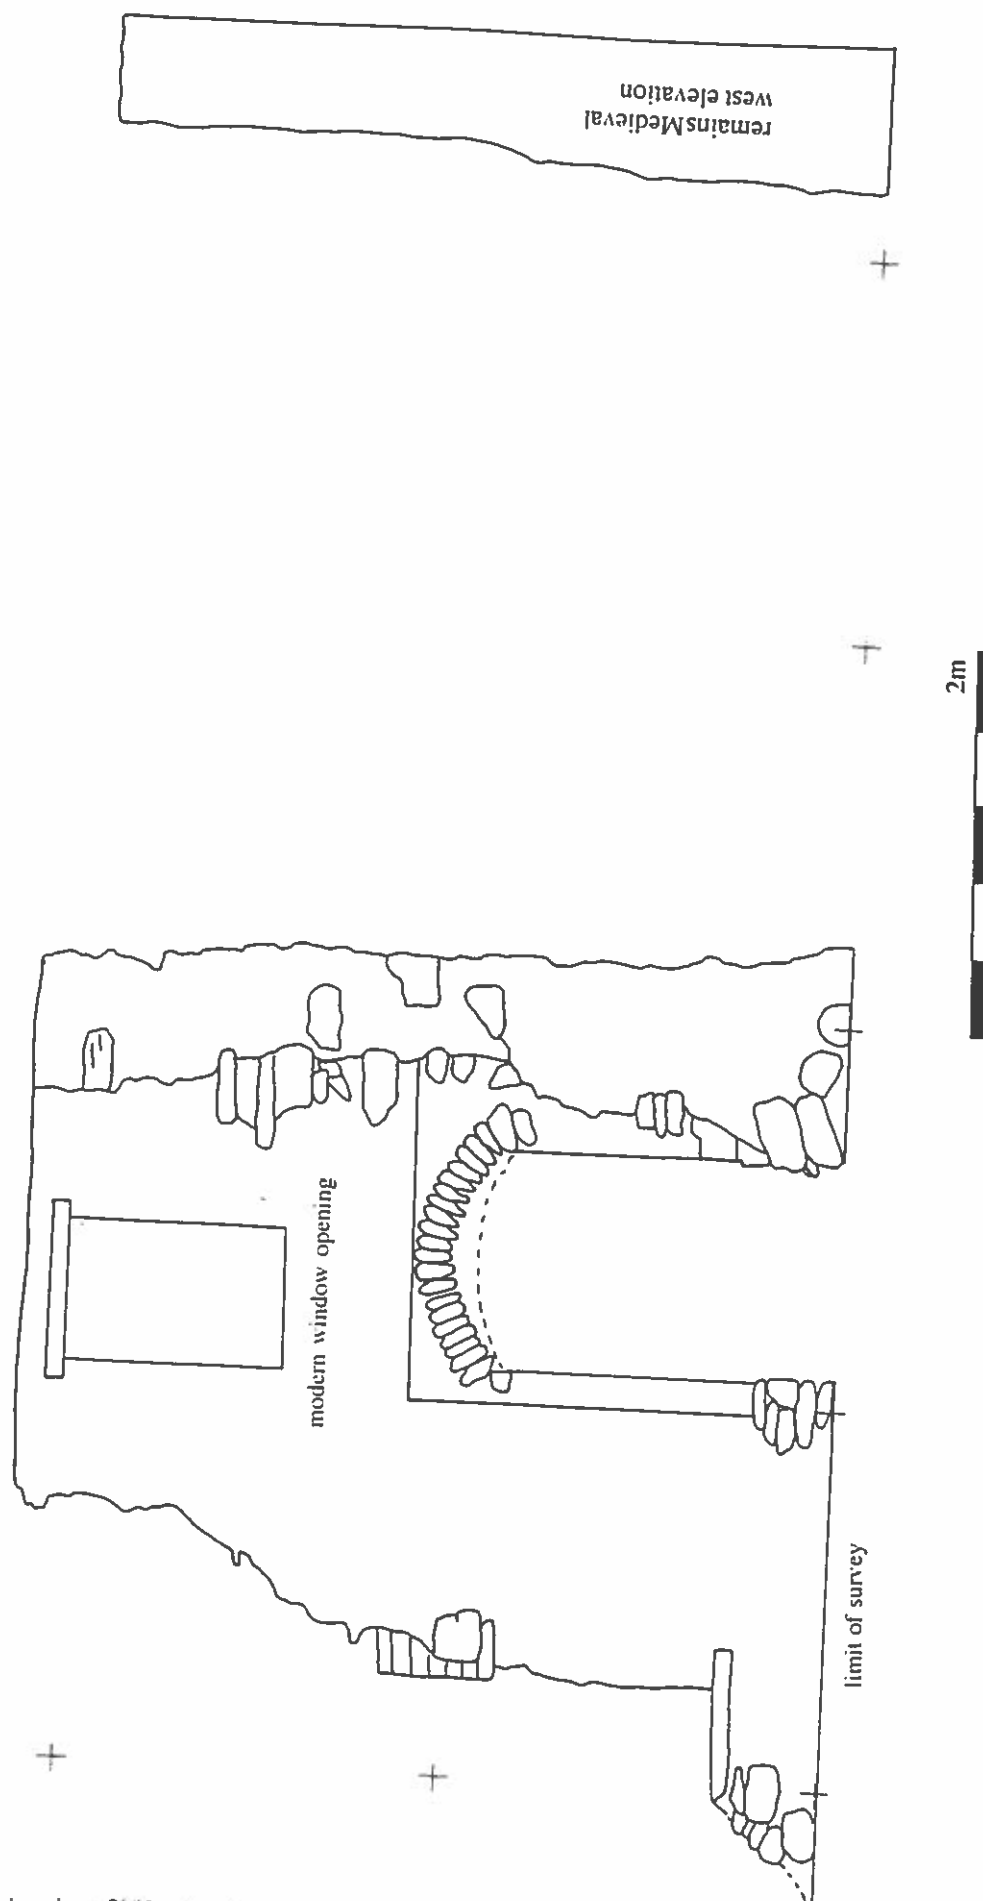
AREA B: EAST-FACING INTERIOR ELEVATION AND DOOR OPENINGS
